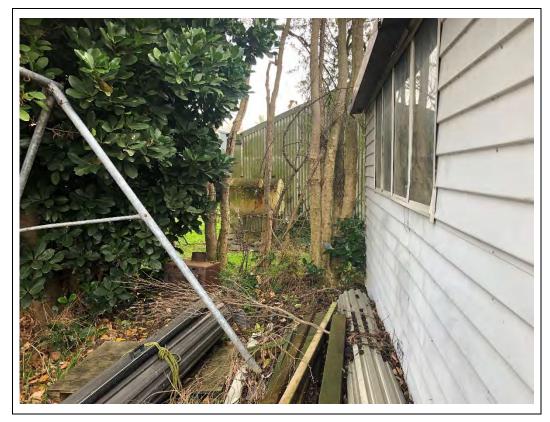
Appendix B.1: Store building adjoining the southern wall of the large glasshouse.
